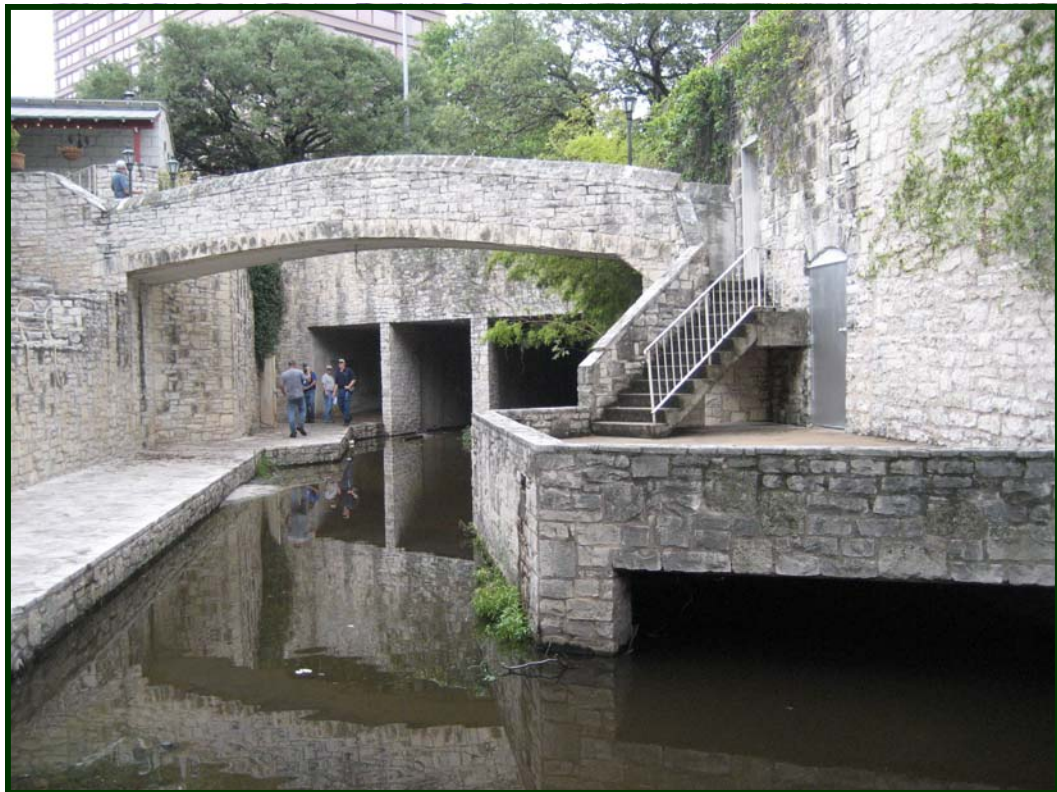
~ 11TH STREET BRIDGE, LOOKING DOWNSTREAM
